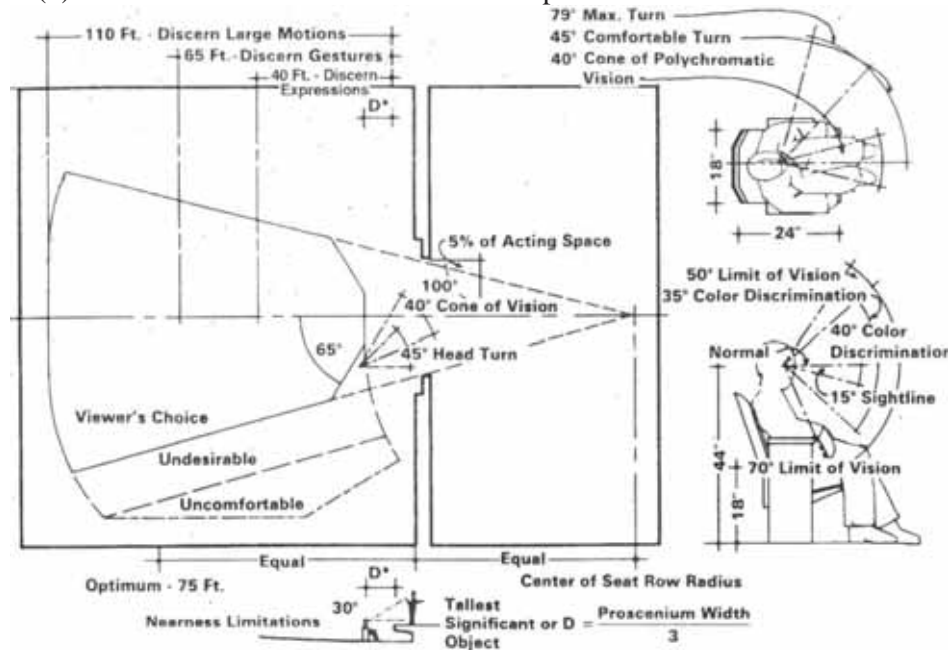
CRITICAL DIMENSIONS IN PLAN ARRANGEMENT IN A THEATER
